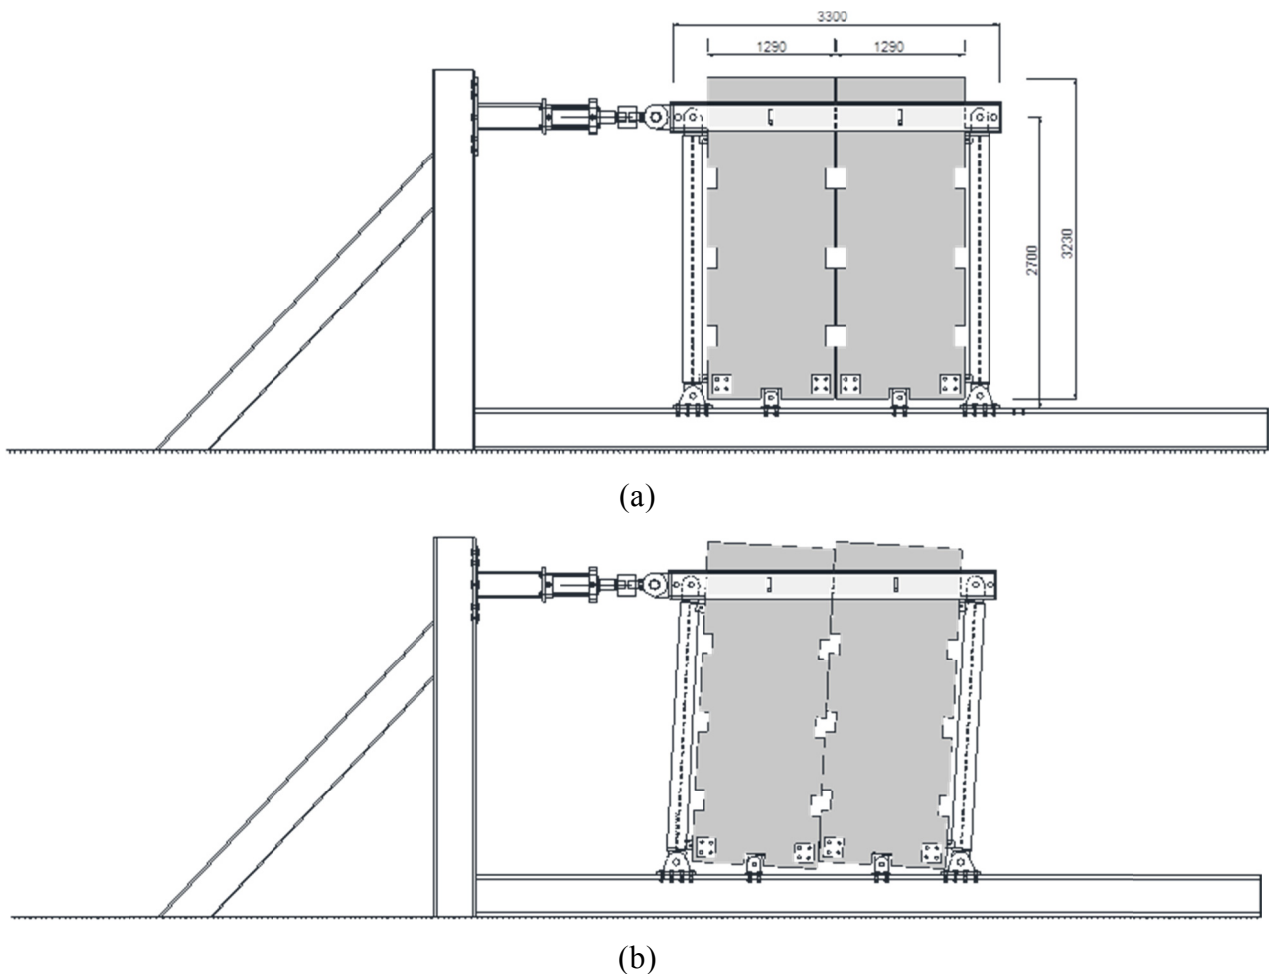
Test setup with pinned panel-to-foundation connection: (a) technical drawing and (b) displaced configuration
